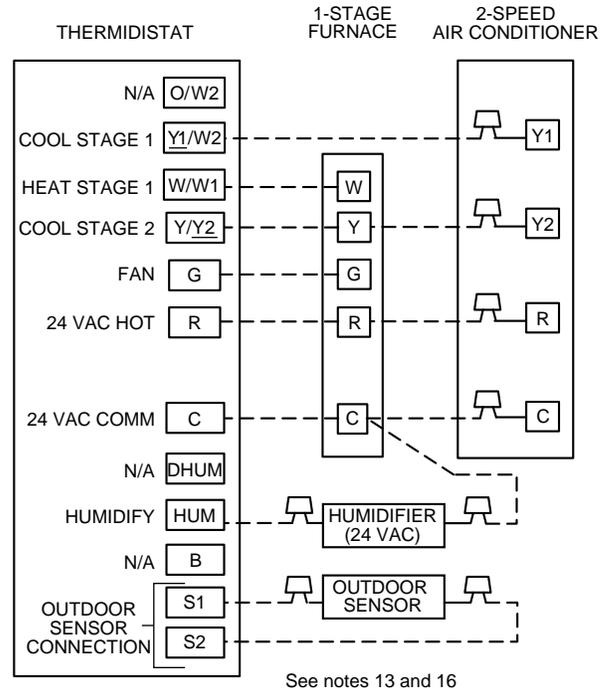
Single-Stage Furnace With 2-Speed Air Conditioner
